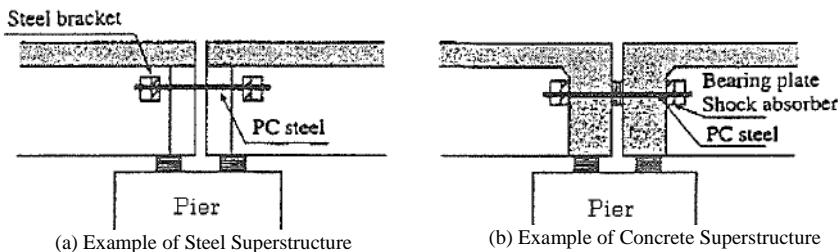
Unseating Prevention Structures Connecting the Two Adjacent Superstructures
